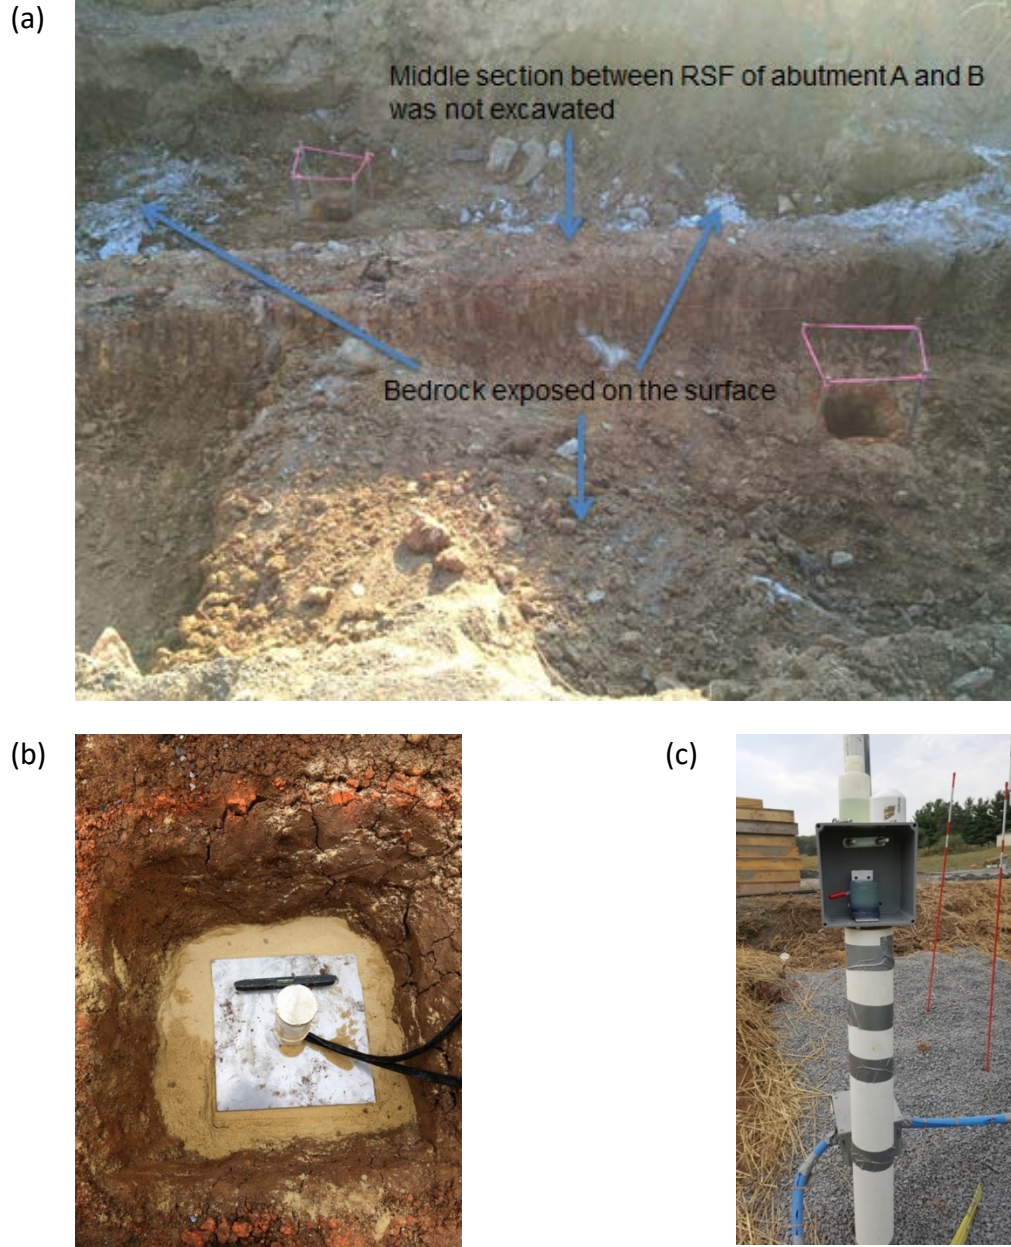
Installation of soil extensometers in Abutment A
